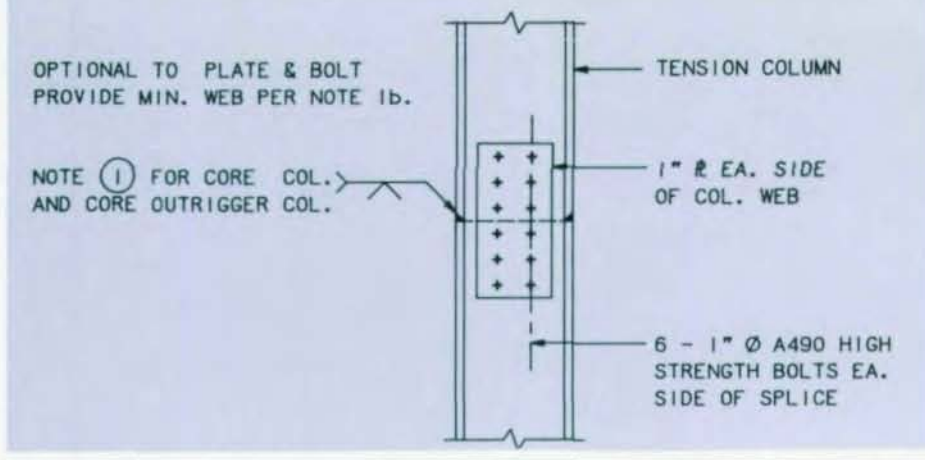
Typical splice detail of tension and outrigger columns. Note—provide weld to develop greatest of following: (a) 200 kips tension minimum; (b) min. size = $t/6 + 1/8$ ”; $1/3$ of column capacity is tension.
